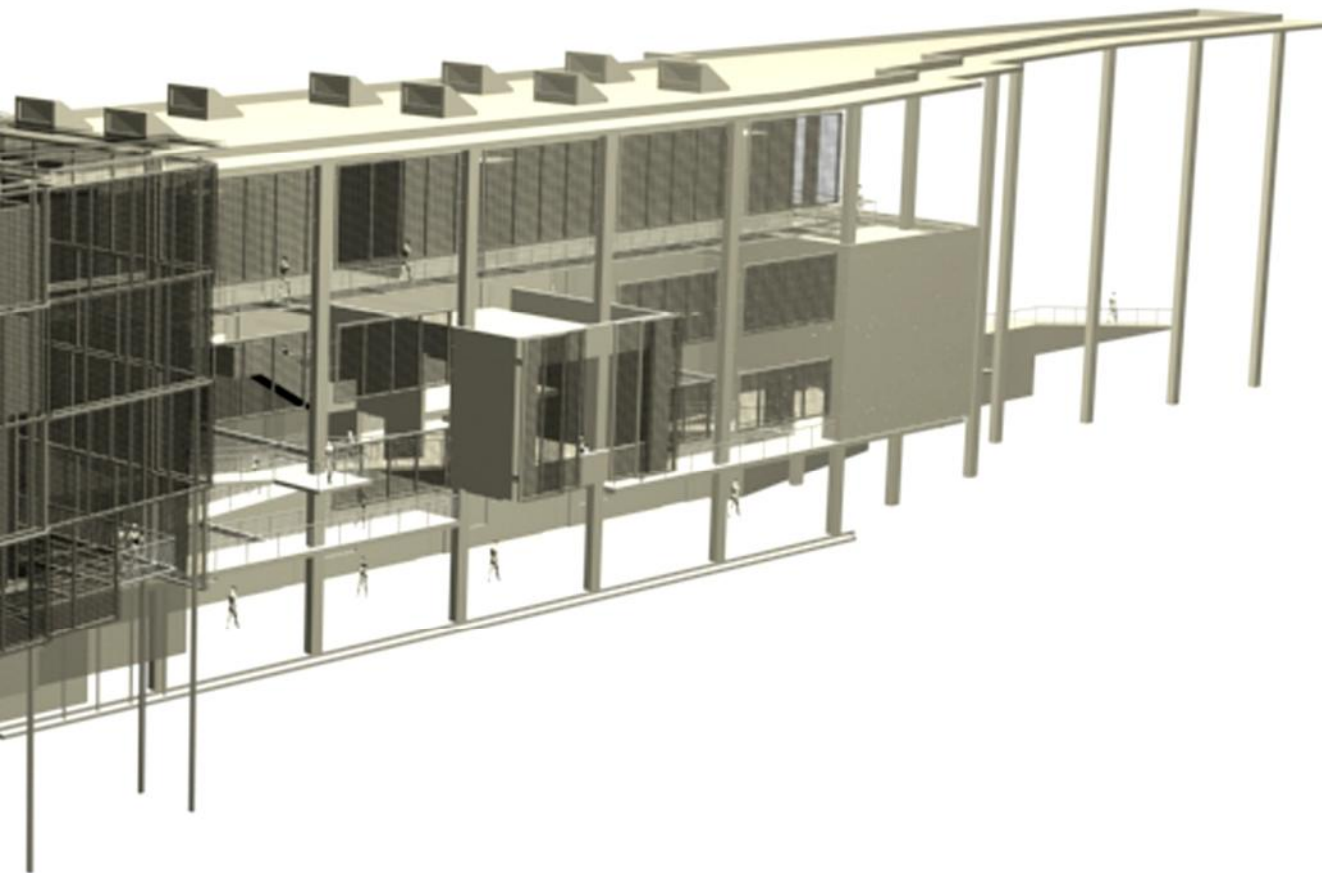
isolated elevated south-western 3D image view of the symbiotic building
